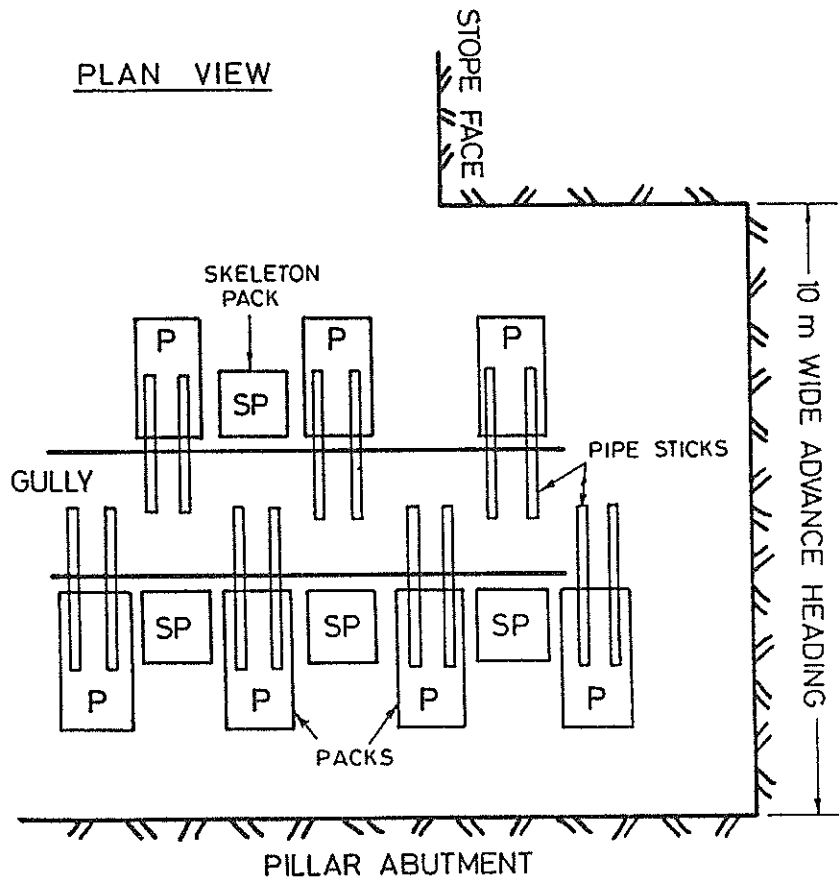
PIPE STICKS, BUILT INTO TOP LAYER OF ELONGATE PACKS, EXTEND OUT OVER GULLY. SKELETON PACKS BETWEEN STANDARD PACKS HAVE COMPLETELY TIMBERED TOP LAYER
